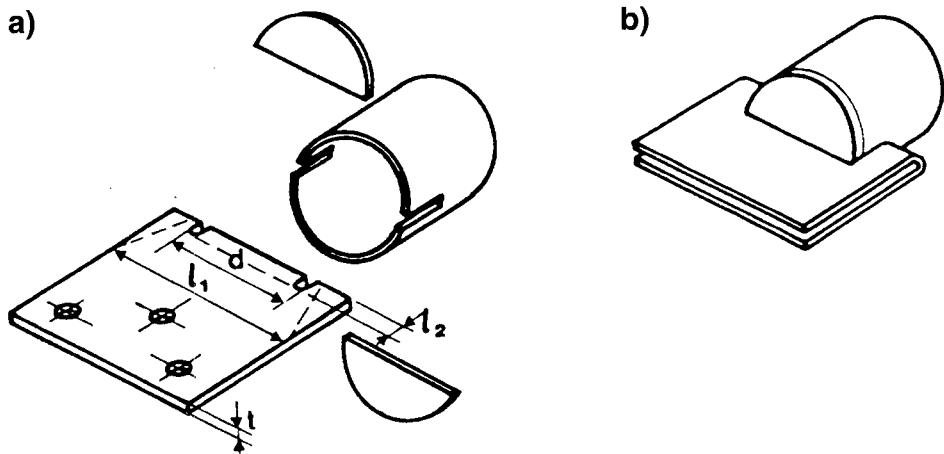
Slotted connection a) with a flat gusset plate b) with a bent gusset plate
